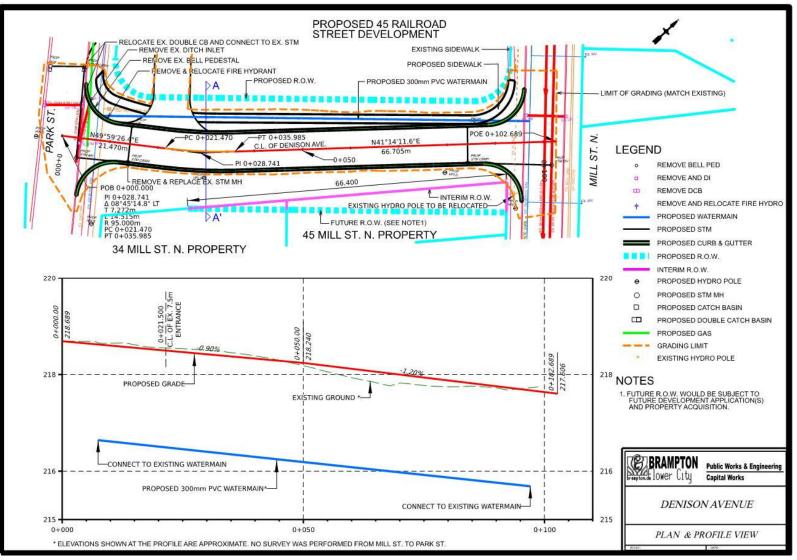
Proposed Denison Avenue Plan and Profile for Preferred Design Option
